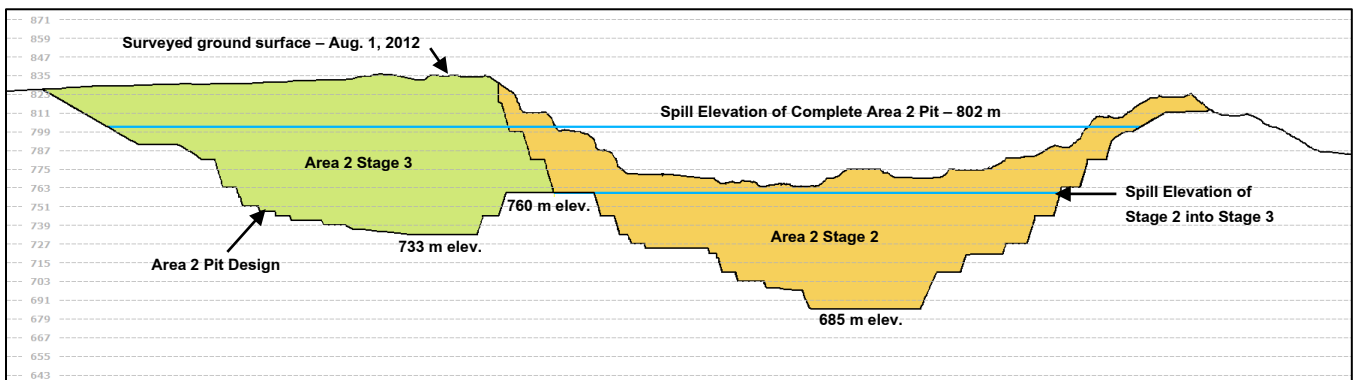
Section through Area 2 Pit showing staging and spill elevations.
